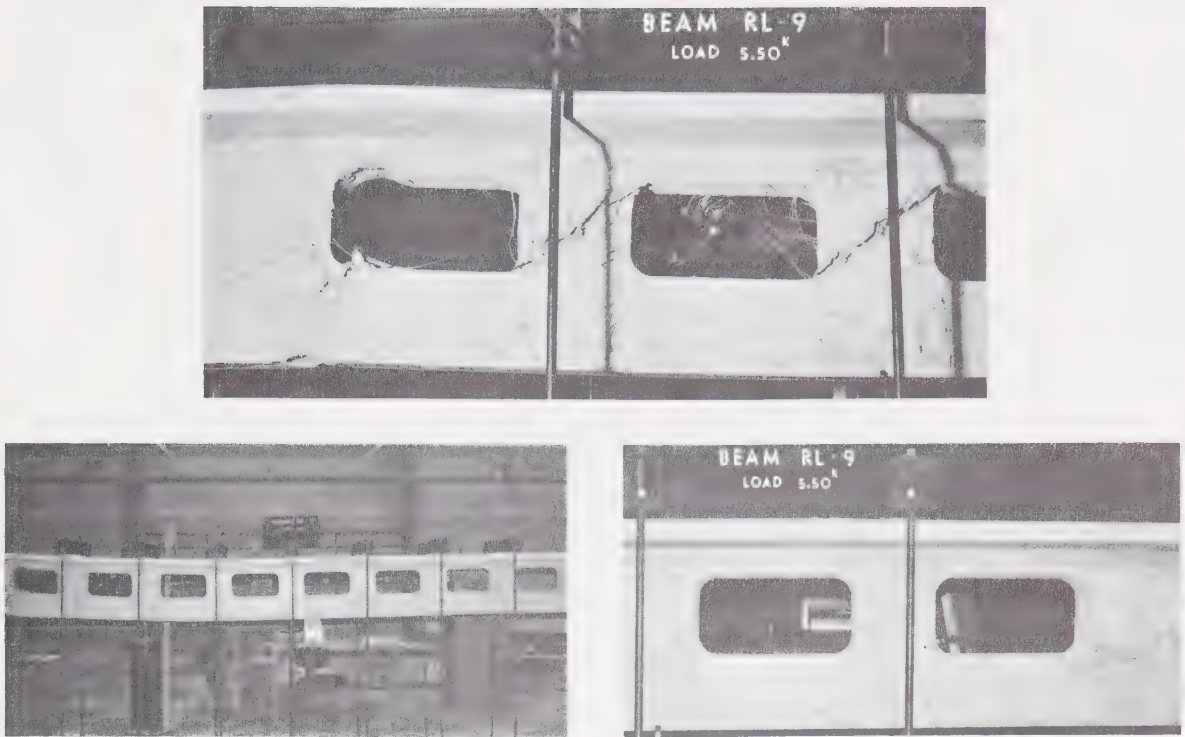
CRACKING AND FAILURE PATTERN OF BEAM 9-16-7L
